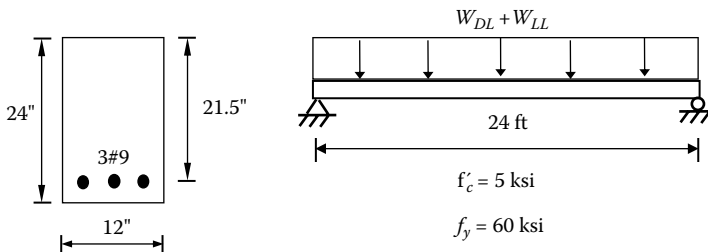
Example 15.3 of ACI 440.2R-08 showing the beam profile and the cross-section details.
